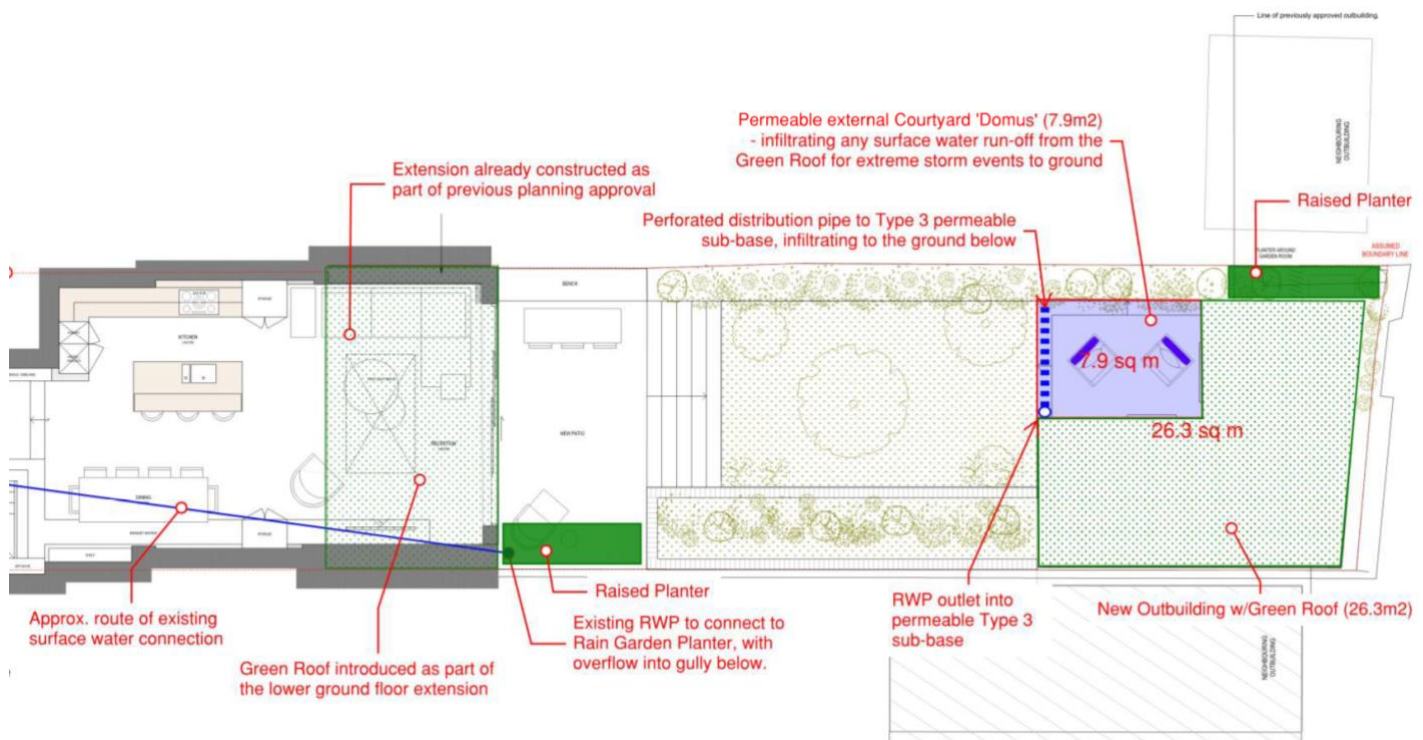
Part of a drainage plan showing the proposed SuDS for a small ground floor extension and garden outbuilding. The SuDS include permeable paving, green roofs and raised planters.
